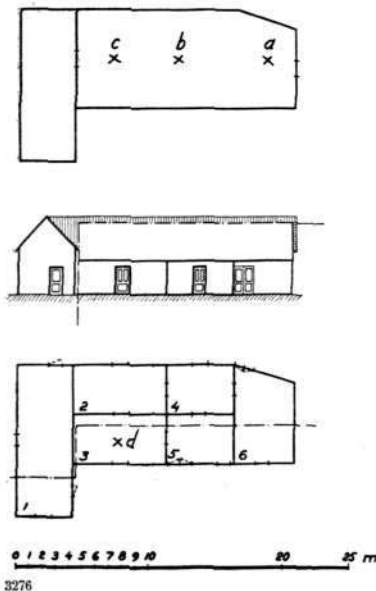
View of the building used for the tests. Top, plan of the garret; below, plan of the ground-floor room.
